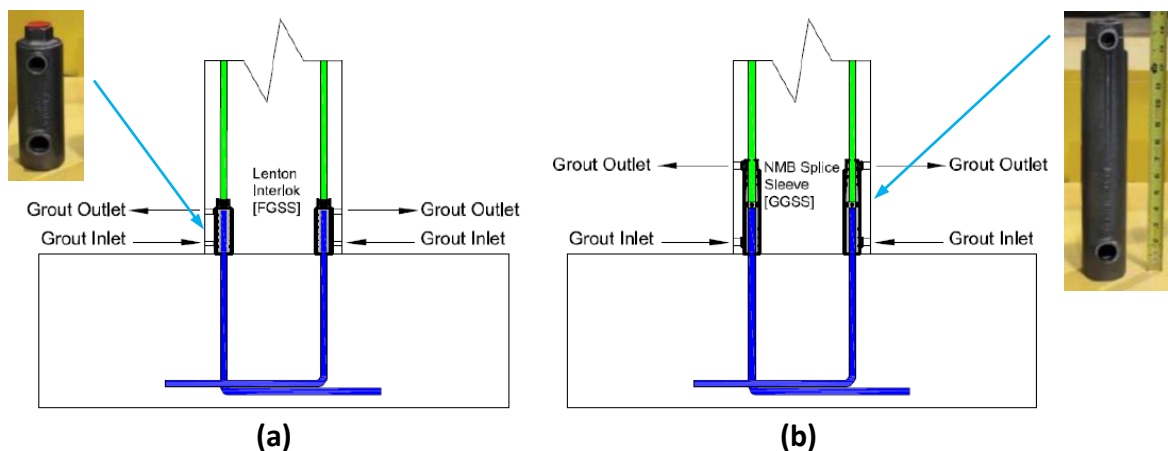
(a) FGSS Column-to-cap Beam and (b) GGSS Column-to-footing Connections⁽⁶⁾
